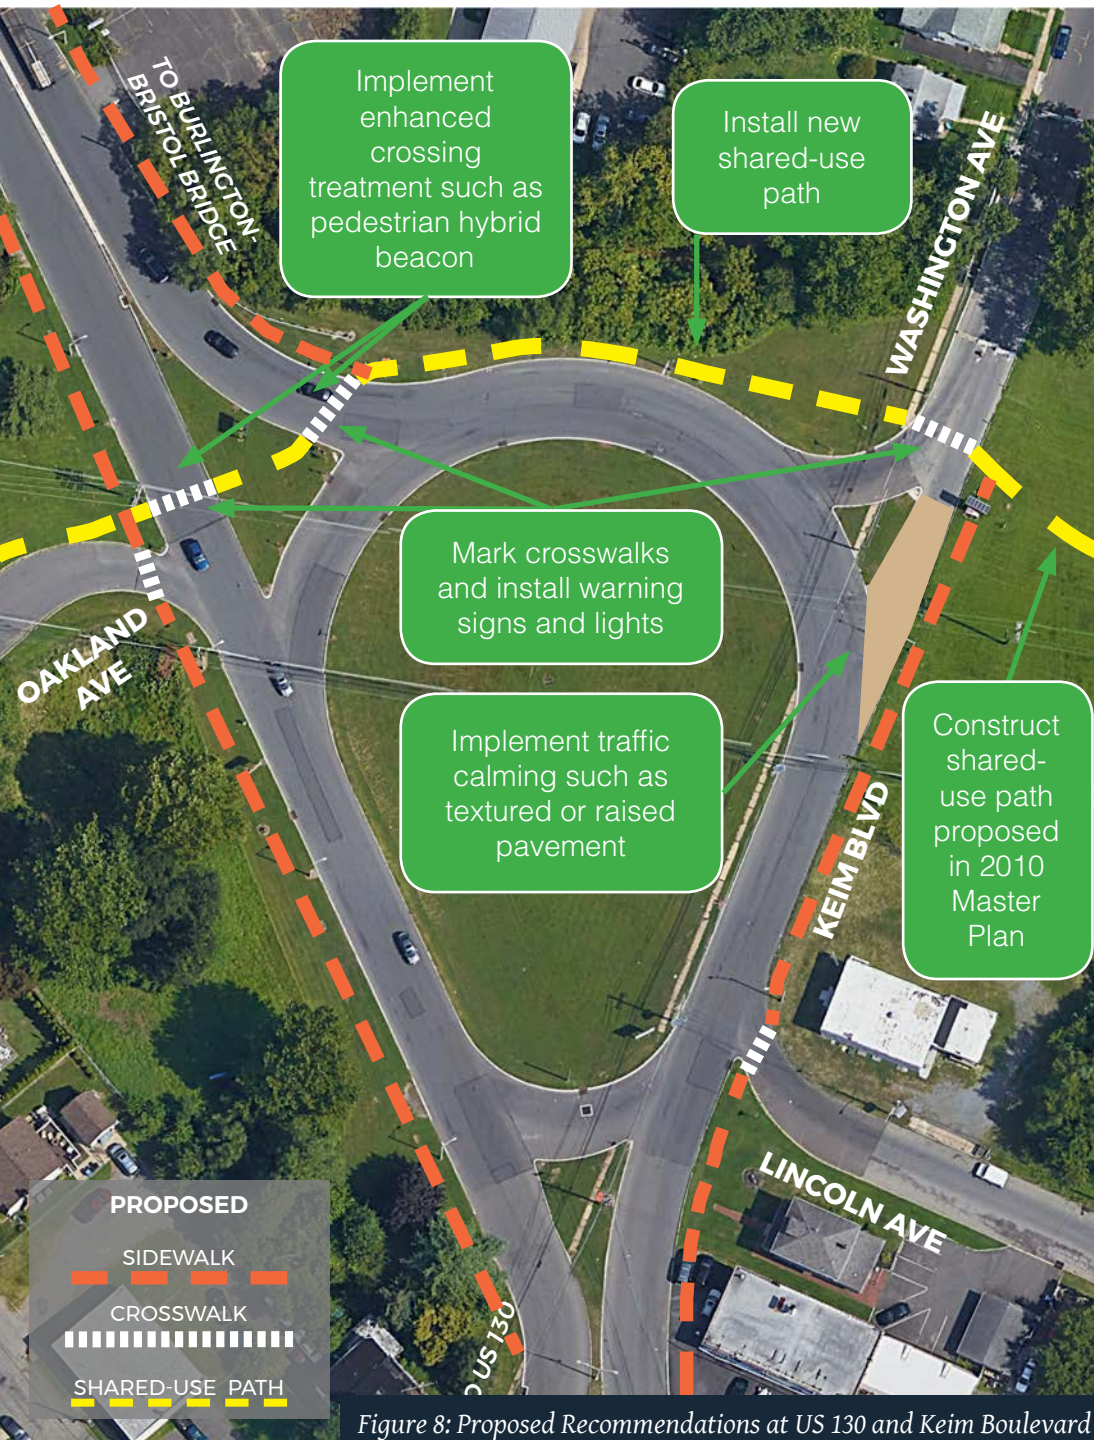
Proposed Recommendations at US 130 and Keim Boulevard
